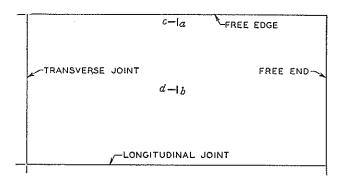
PLAN OF 10- BY 20-FOOT SECTION SHOWING LOCA-TION OF THE FOUR TYPICAL STRAIN GAGES REFERRED TO IN THE DESCRIPTION OF THE METHOD OF DETERMINING RESTRAINED WARPING STRESS.
